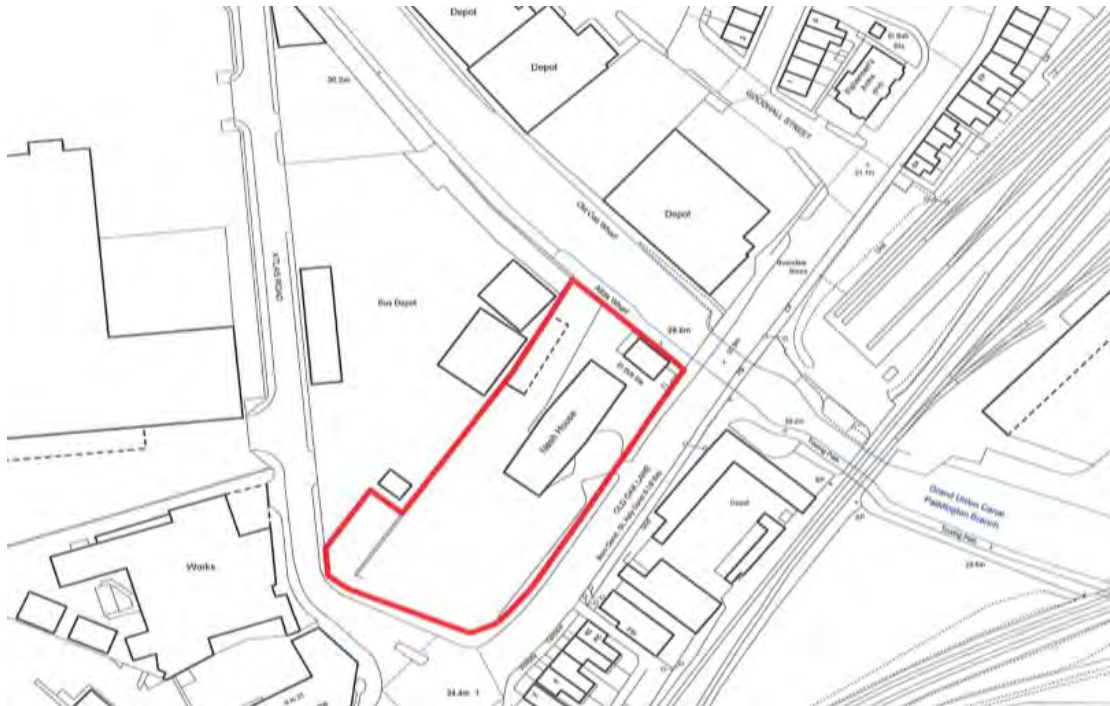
Site Location Plan at Nash House, Old Oak Lane, Park Royal, NW10 6UA
